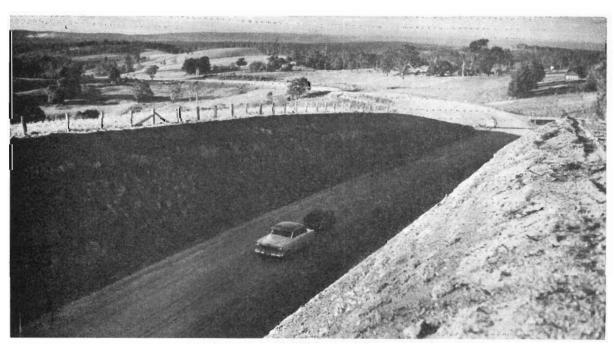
Alberton Shire. Yarram-Traralgon Road. One mile of realignment at Willung South.
